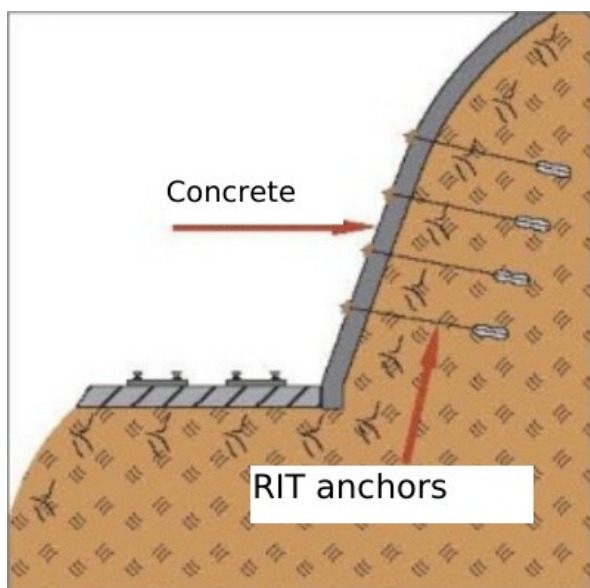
Stabilisation of fractured rock slopes with concrete facing and RIT anchors.
